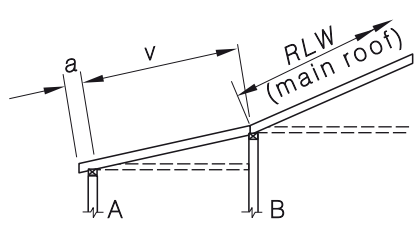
ROOF LOAD WIDTH (*RLW*)—COUPLED ROOFS WITH NO UNDERPURLINS
